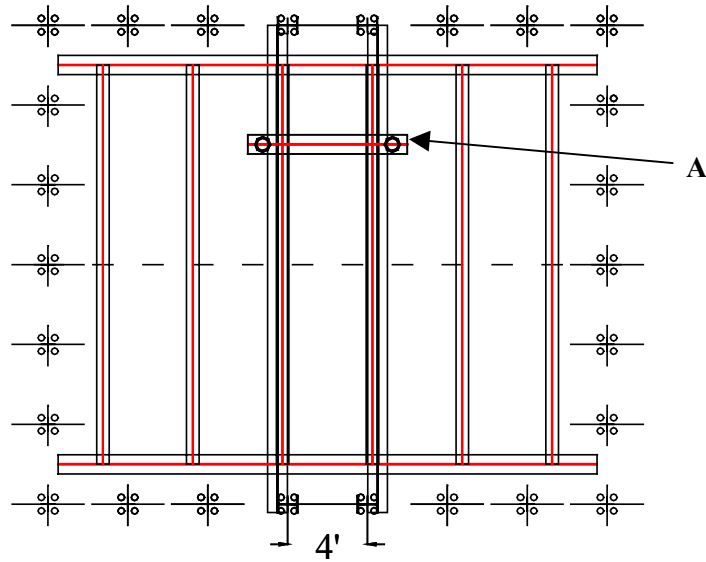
Plan view of specimen, loading frame, and surrounding tie down bolt groups
